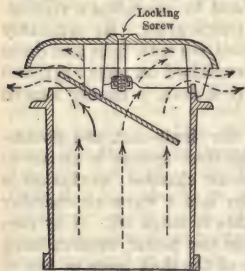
Mushroom Ventilator with Cast-iron Sleeve. Especially Adapted for Concrete Floors
